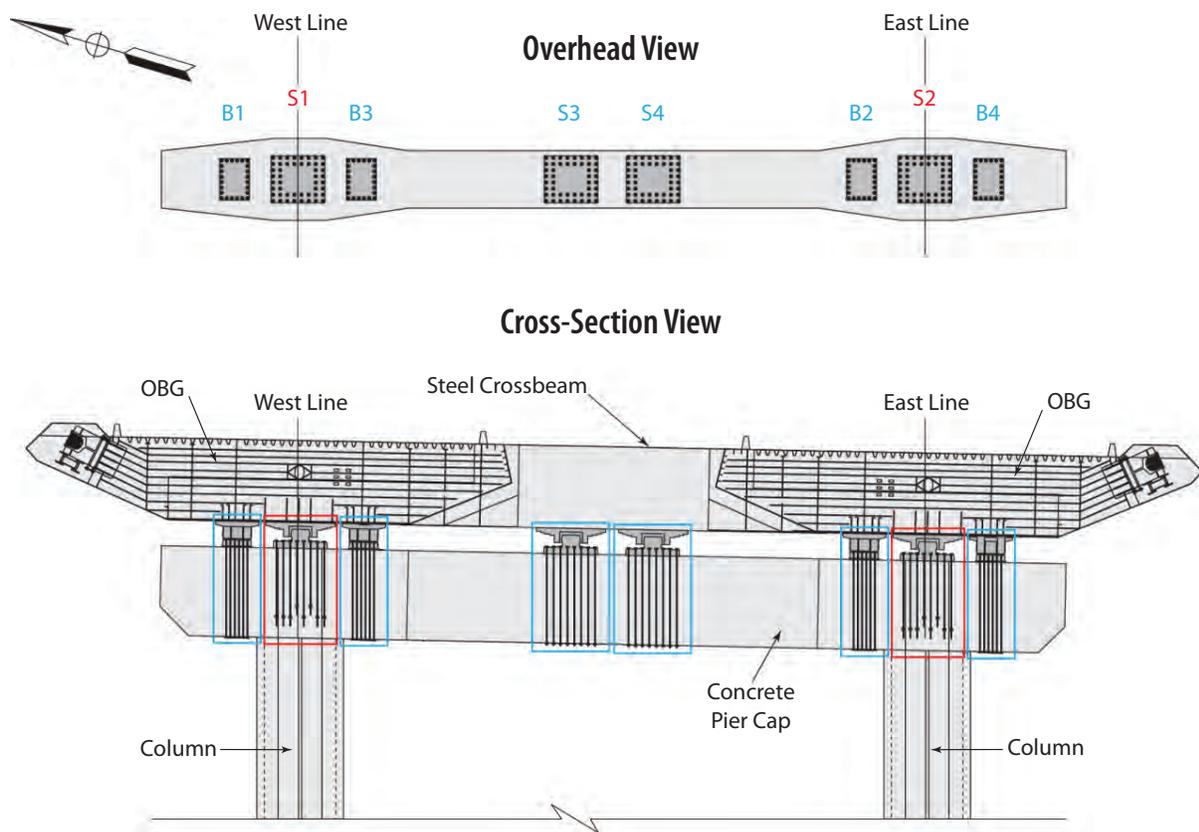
A354 grade BD rod locations on the SAS Bridge
